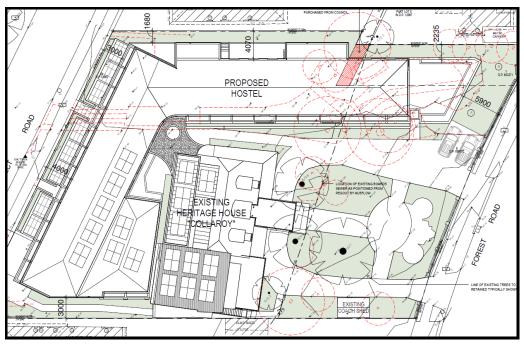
The Proposed Development (Source: Innovate Architects, October 2020)
